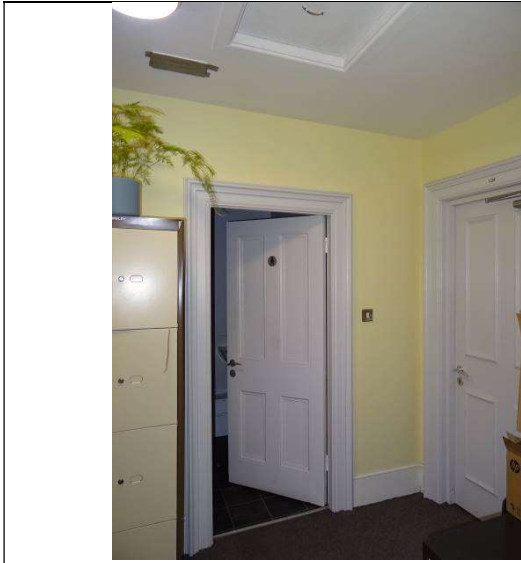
Hallway with doors to bow-ended room to west (r) and WC (l)
